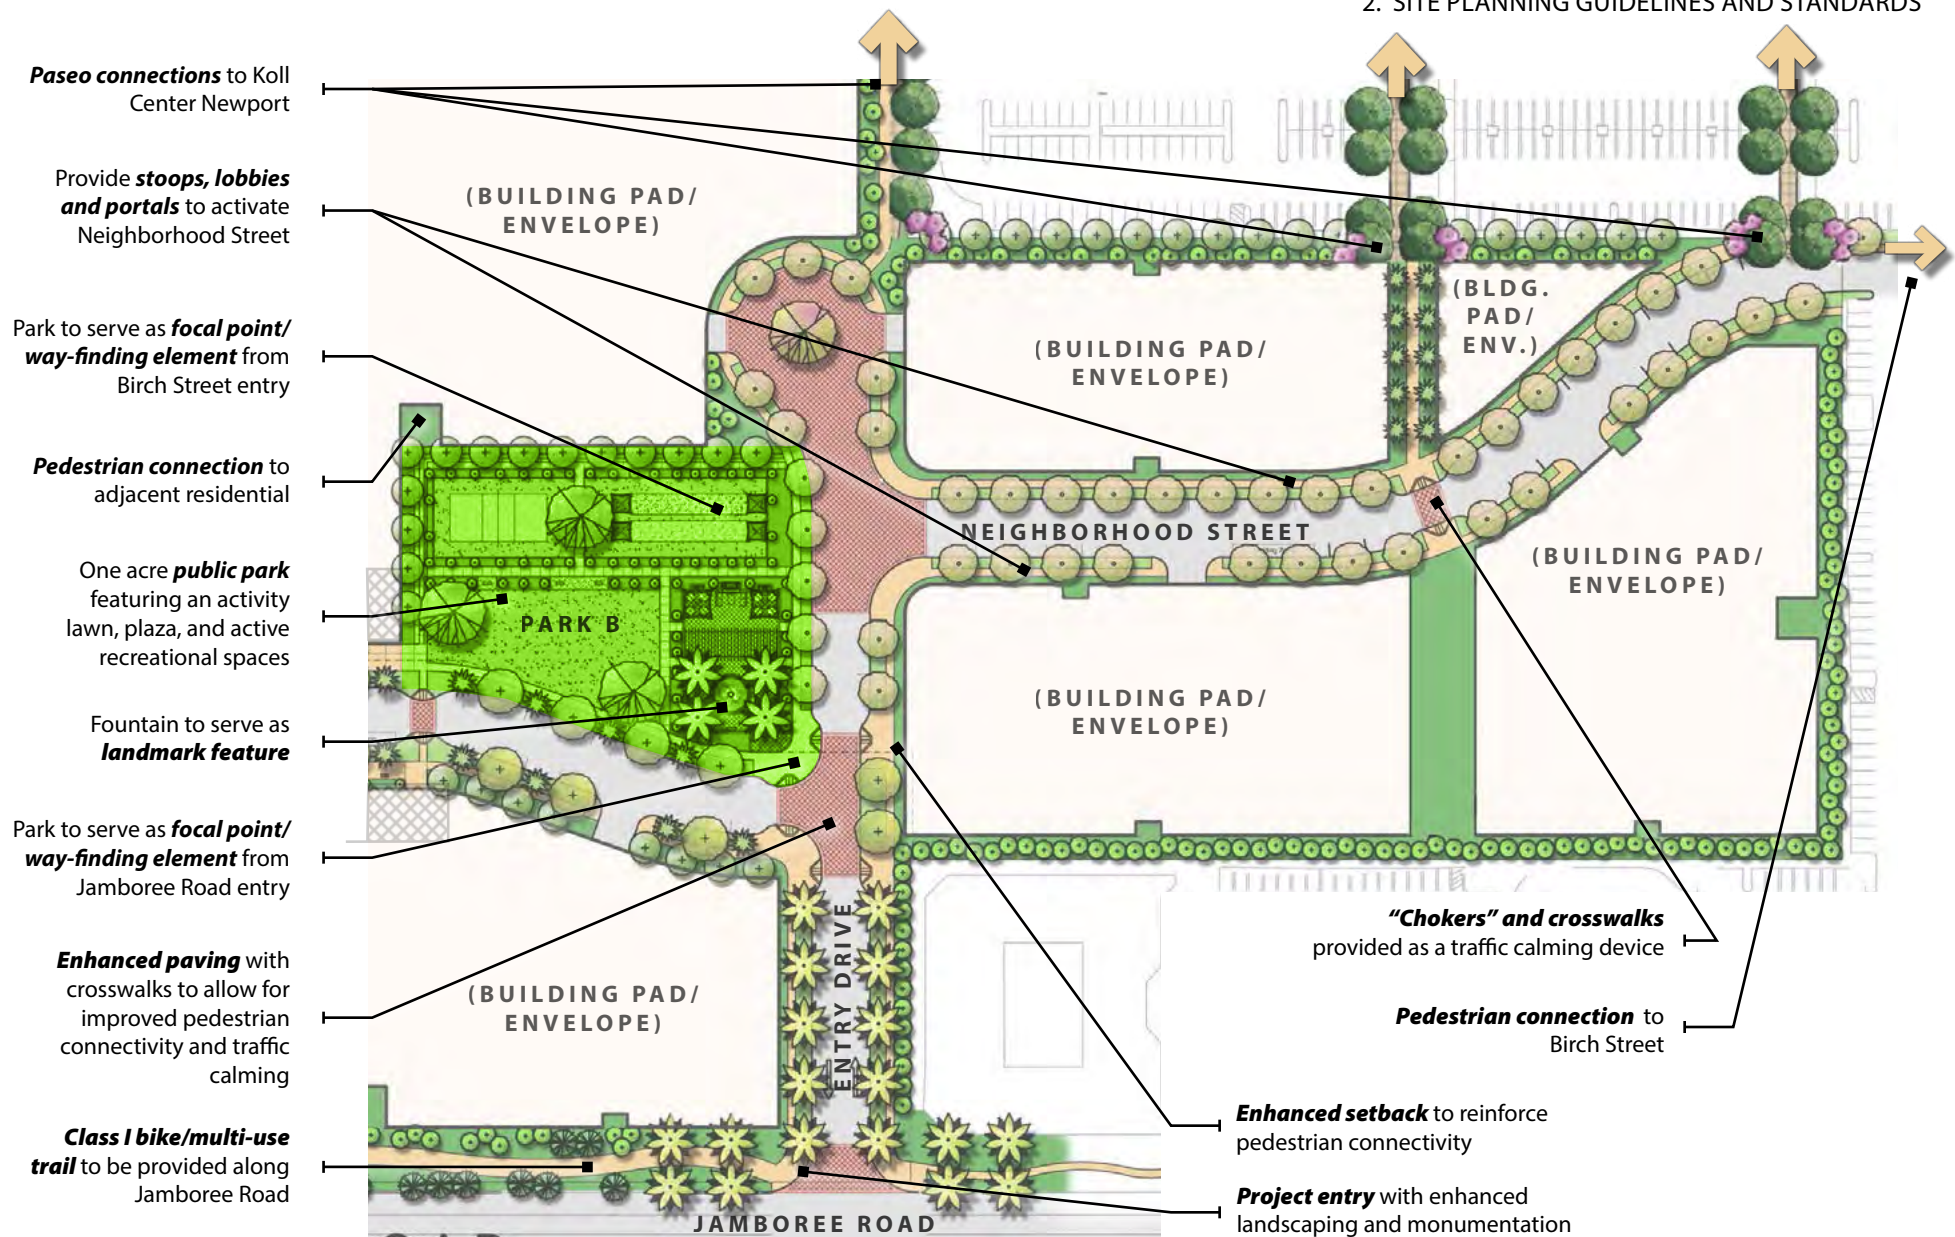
Secondary Entry, Birch Street Entry and Park B
